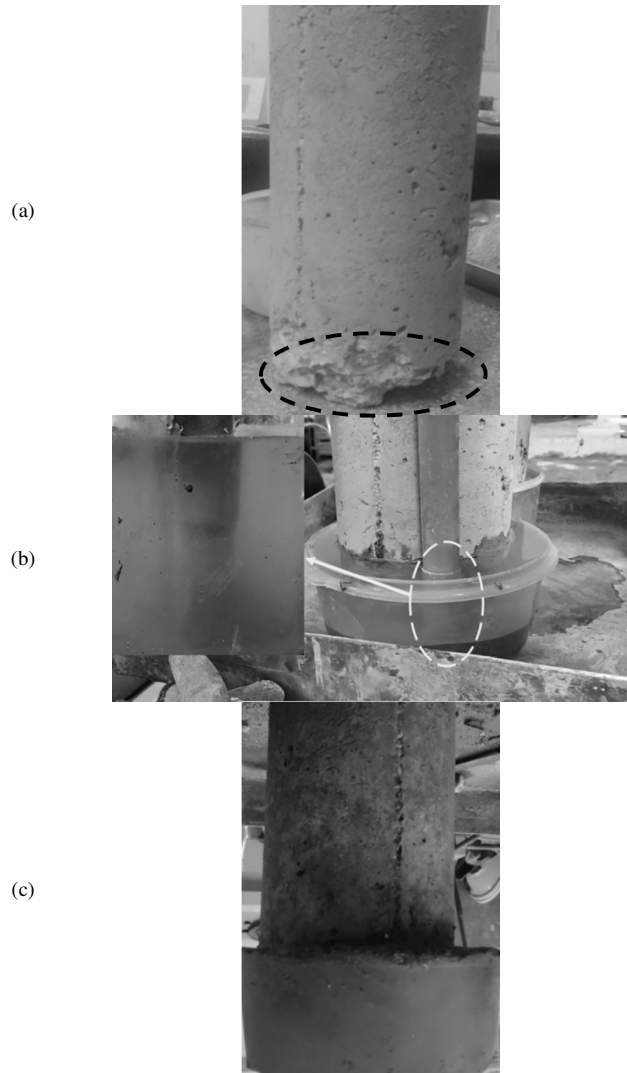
Specimen preparation: (a) Damaged column, (b) underwater concreting with the tremie casting method, (c) column after rehabilitation with underwater concreting.
